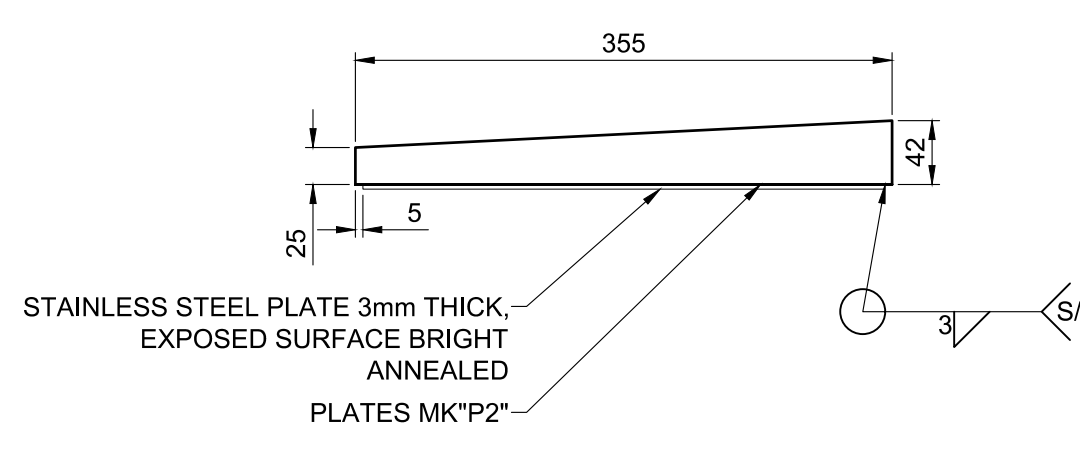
DETAIL - BEARING PAD MK "B1" ELEVATION
